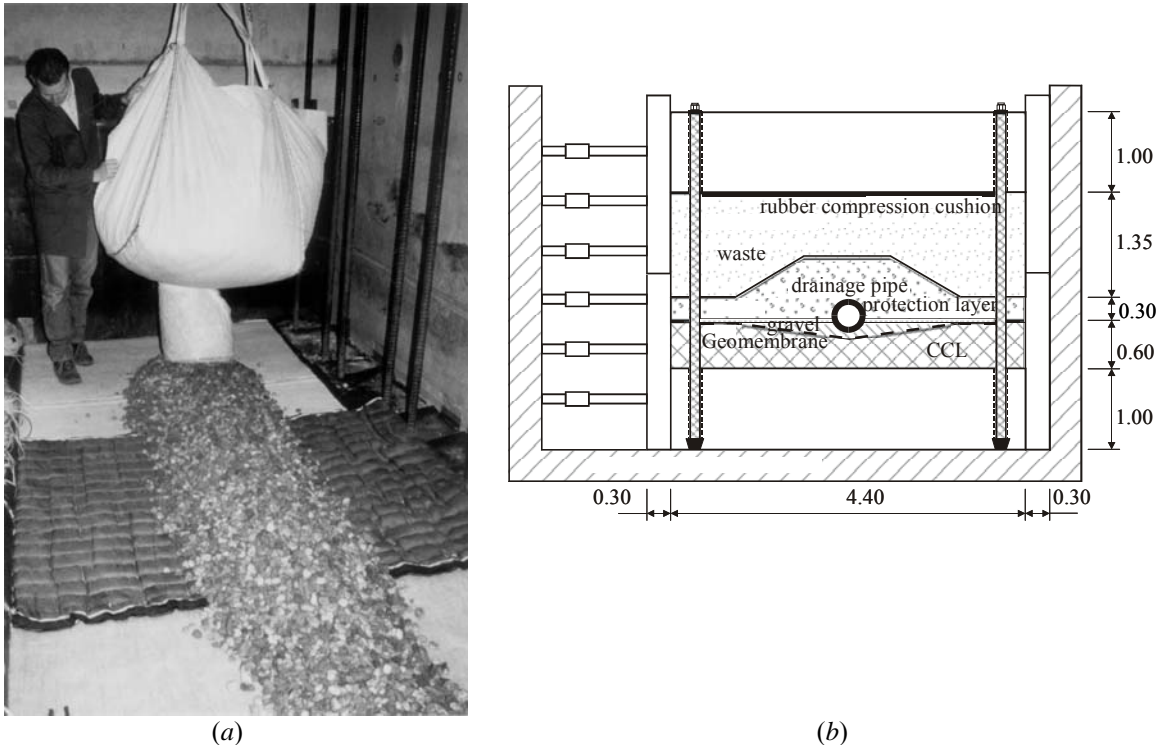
(a) Covering of protection layers, and (b) Cross-section of a large scale laboratory test, (numbers given in metres) (Adapted from Zanzinger 1999)
